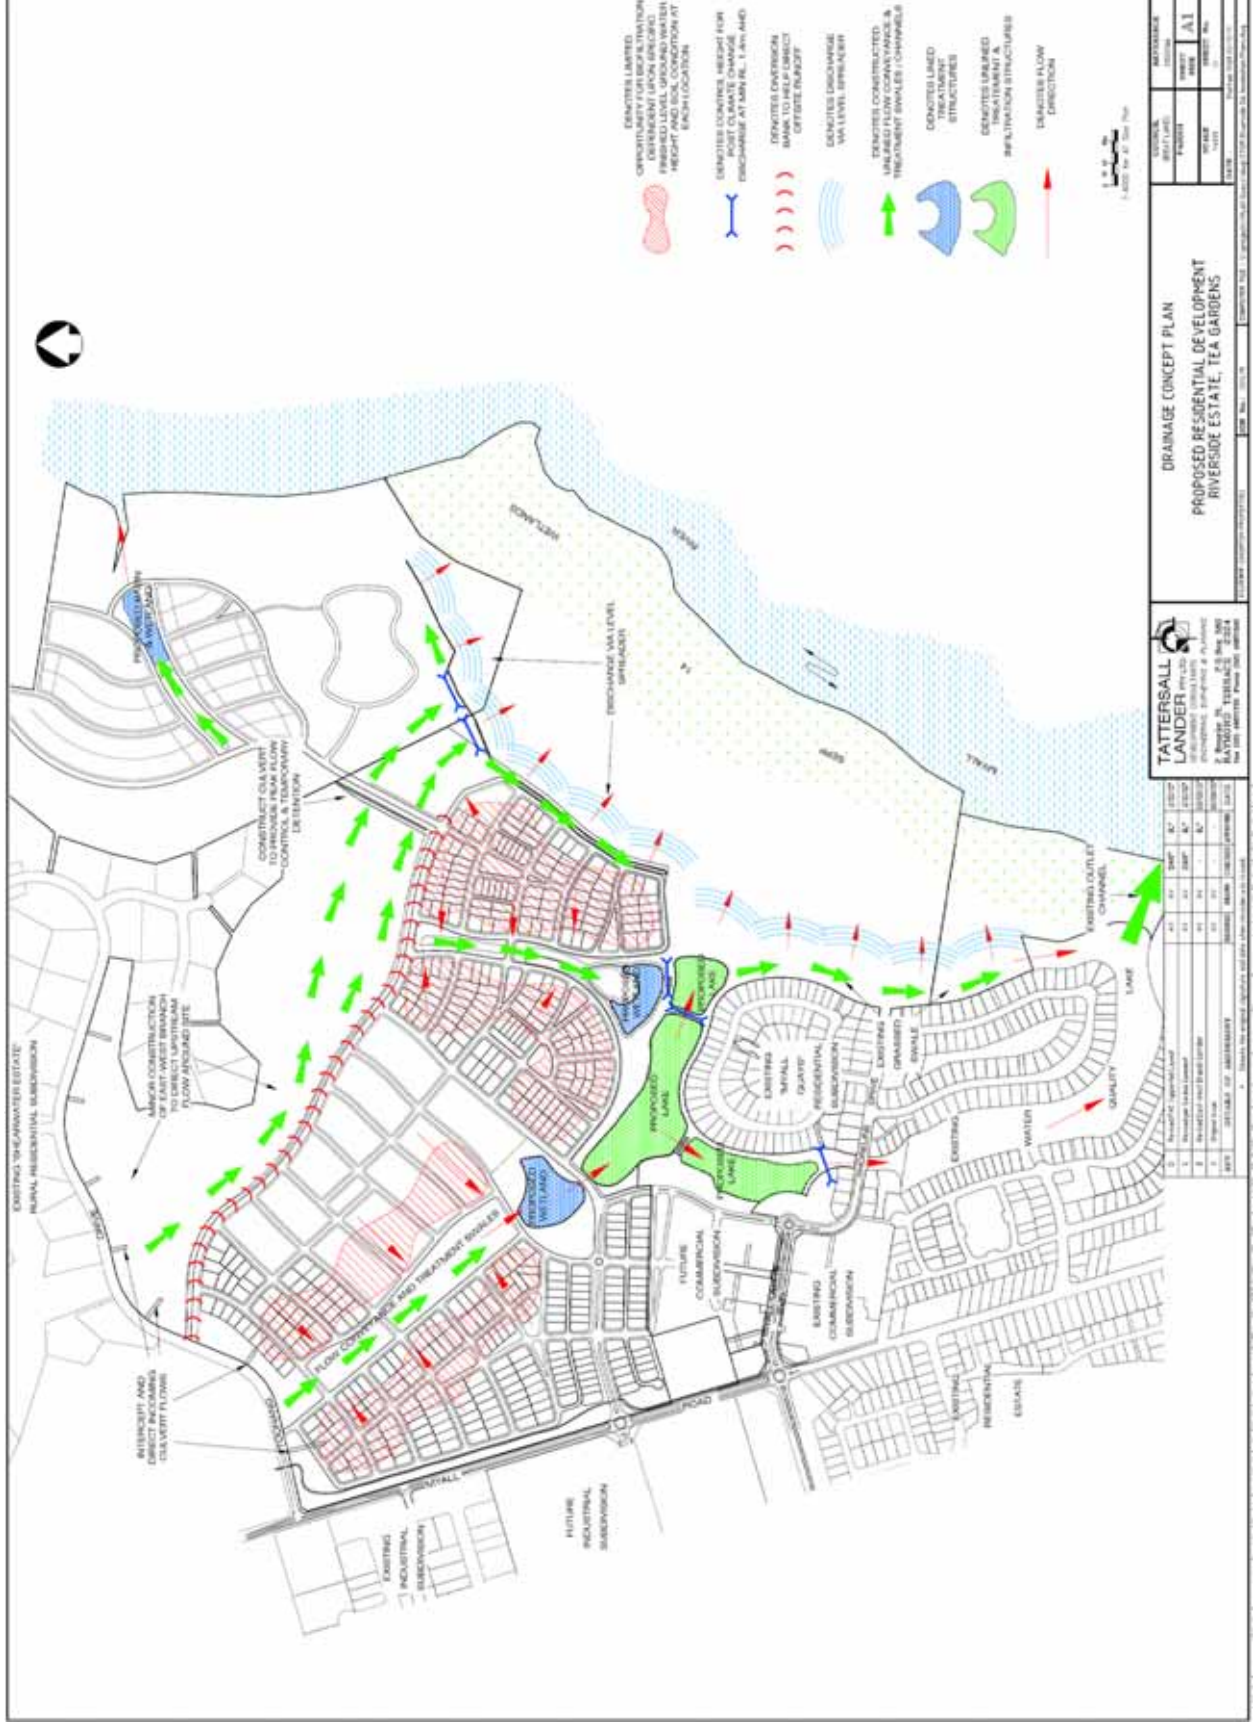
Diagrammatic Stormwater Concept Development Plan – Final Scheme
